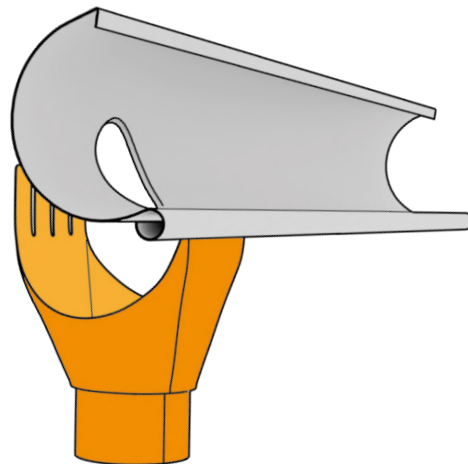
SETTING AND FASTENING OF THE OUTLET GUTTER
